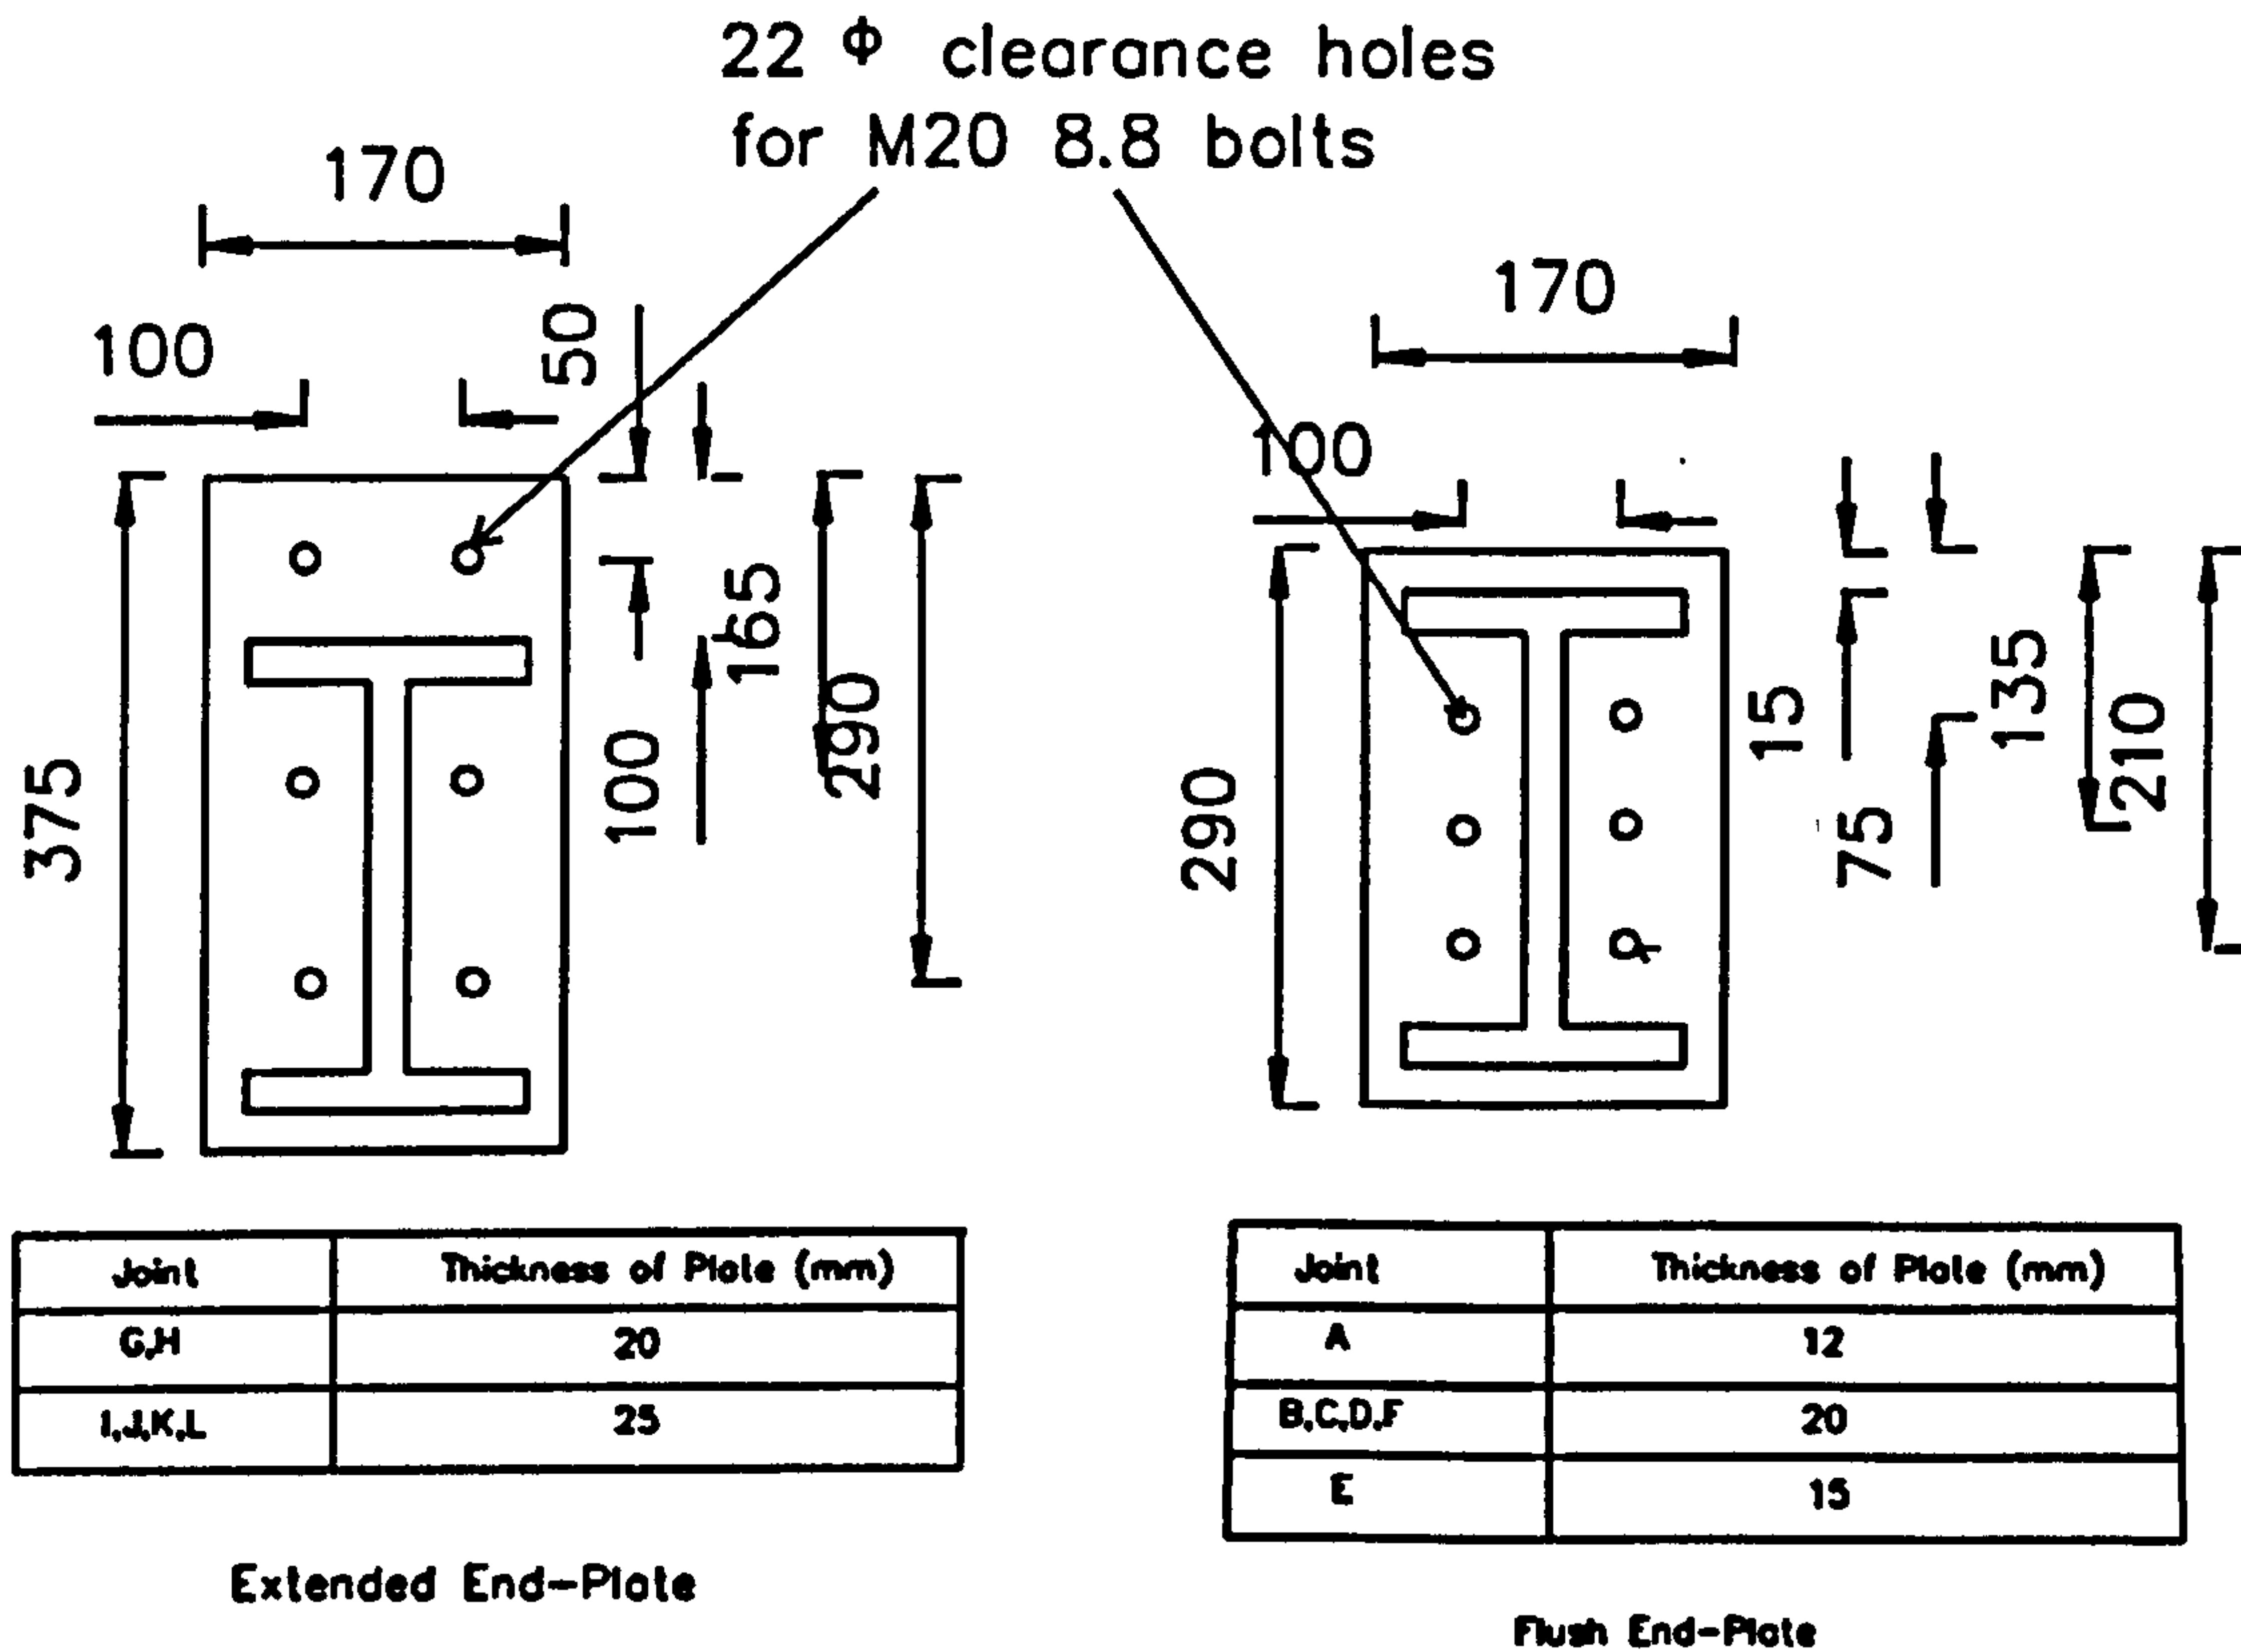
Dimensions of Connections used in Frames 1 and 2
